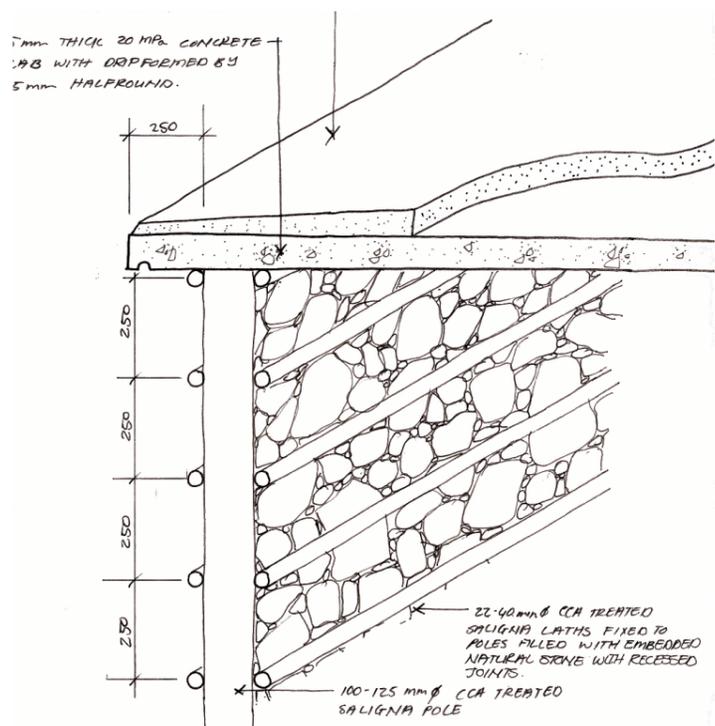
Isometric of Timber and Stone wall
